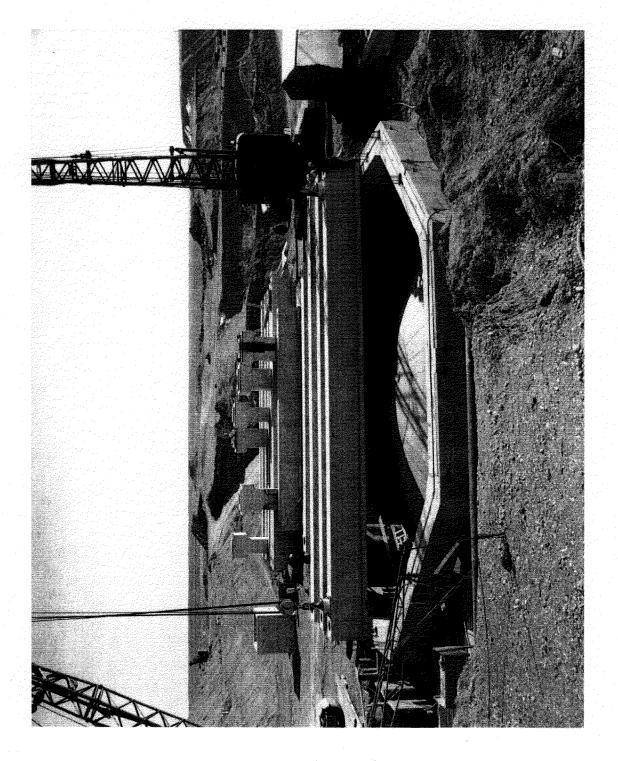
Vault and dome of Tank WM-185 showing the concrete beams and concrete risers on top.
